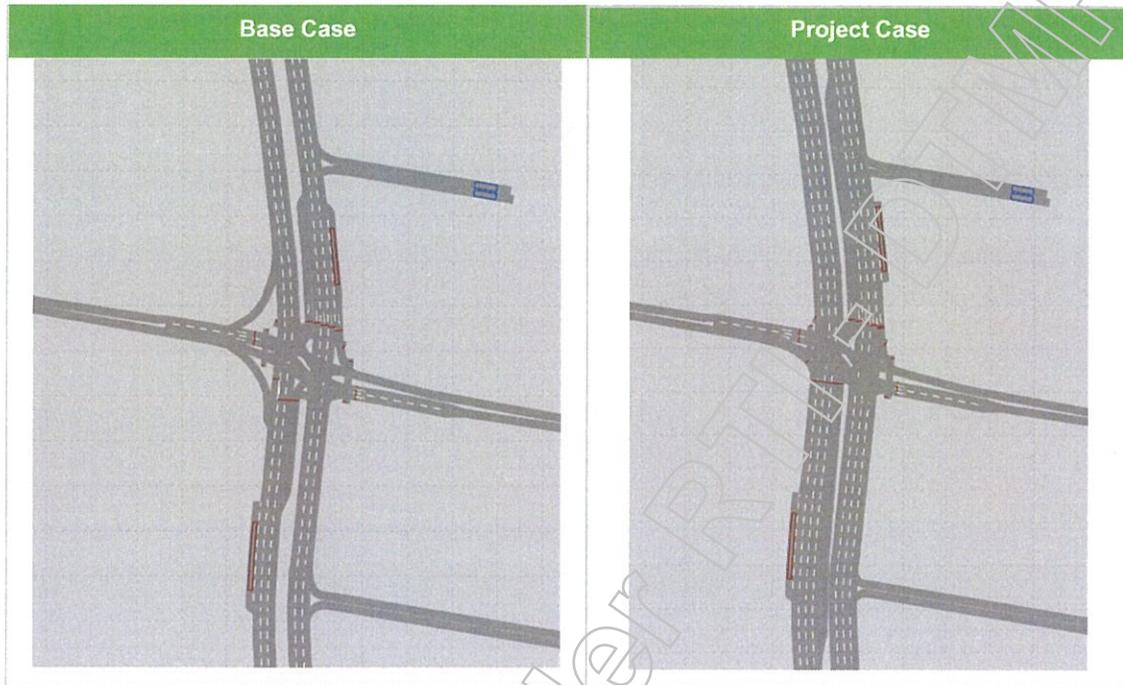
Intersection of Gympie Road / Sports Street / Kitchener Road
